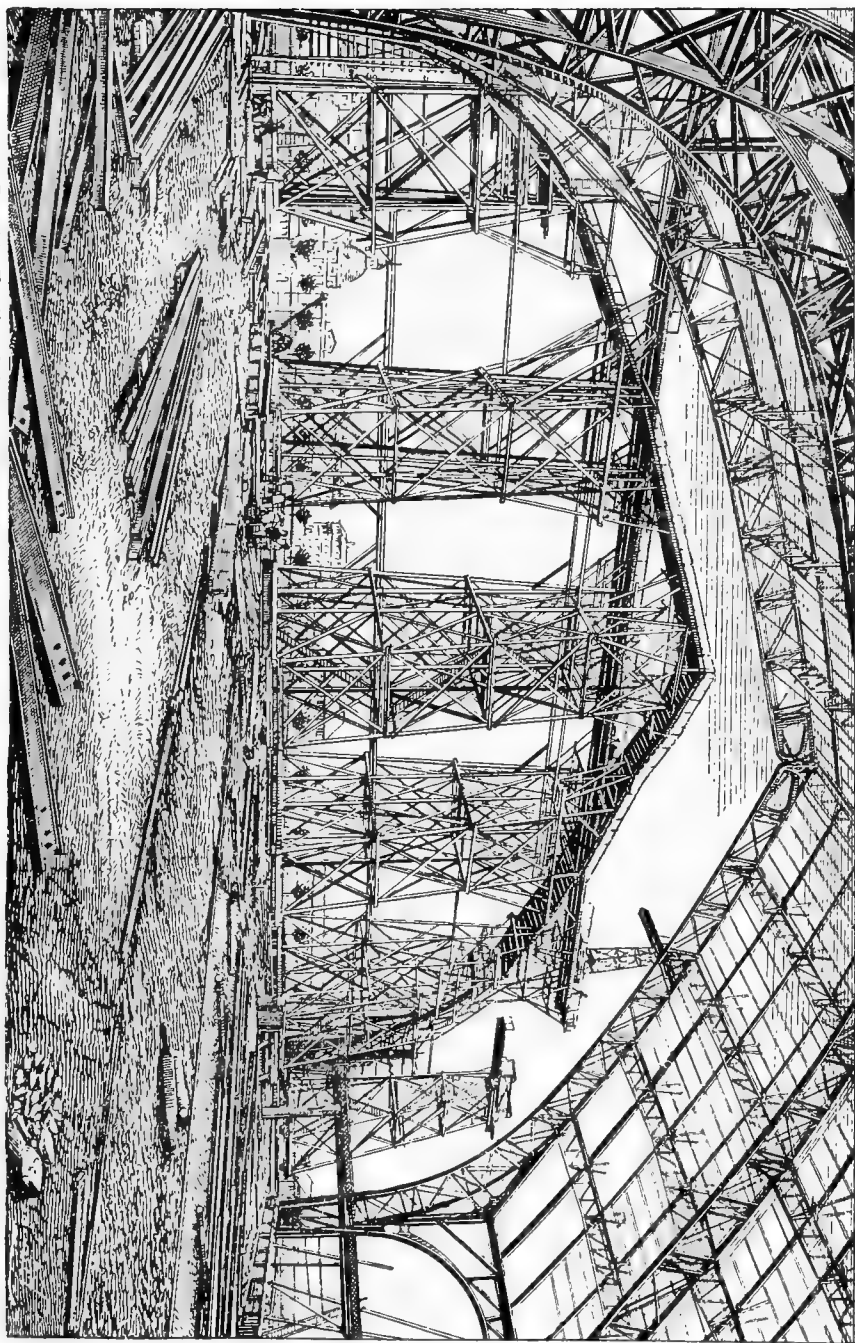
Erection of the great truss girders. Method used by Cail & Co. View of the girders and the erecting scaffolding.
